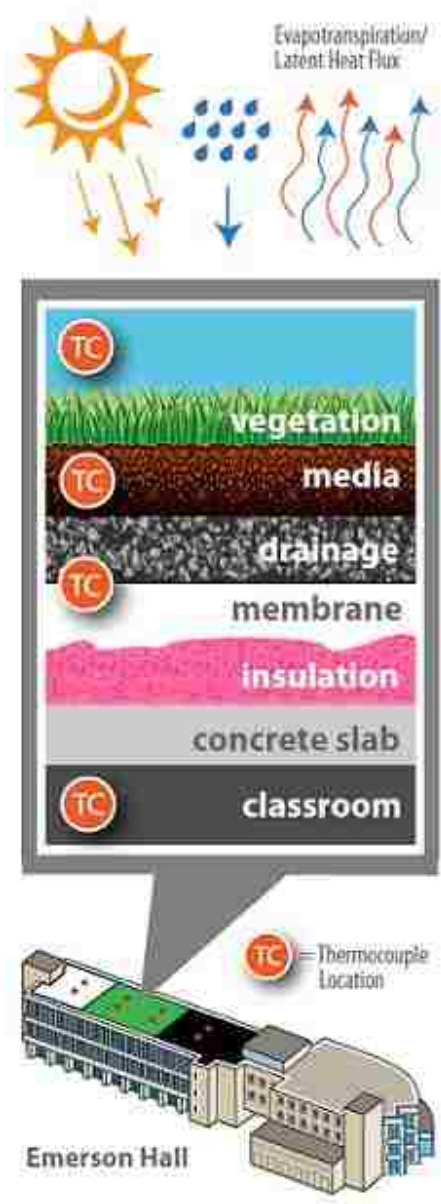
Schematic of full-scale green, white TPO, and black EPDM roofs atop Emerson Hall on Missouri S&T campus
